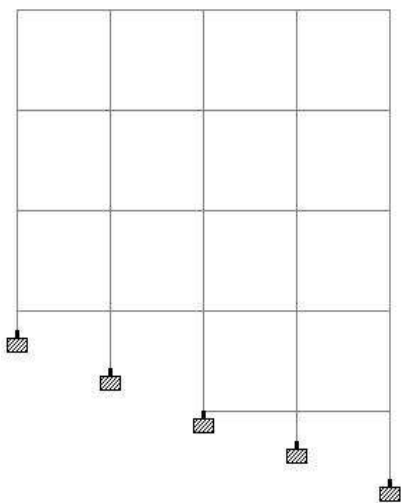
ELEVATION OF A INCLINED GROUND (20°)
